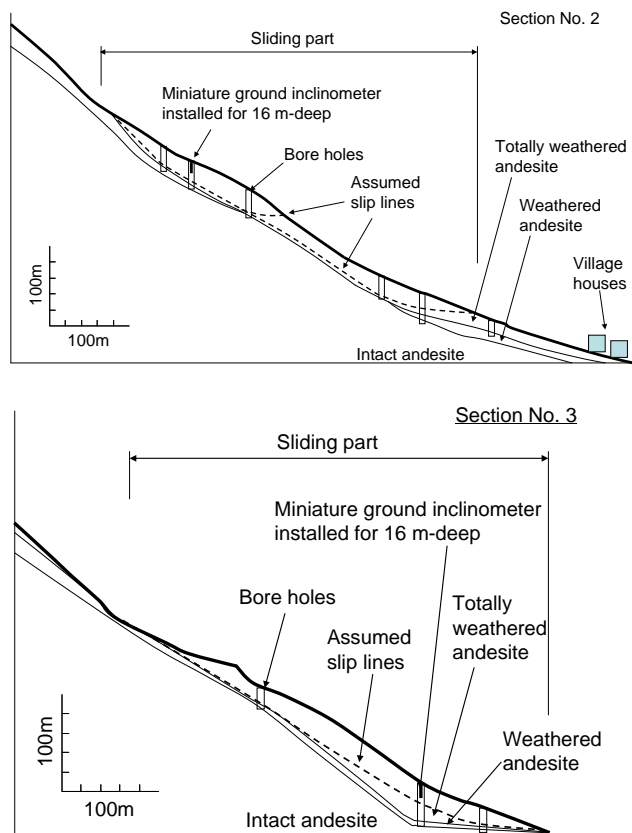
Crosssections of the Taziping landslide site (Sections No. 2 and 3 shown in Fig. 8).
